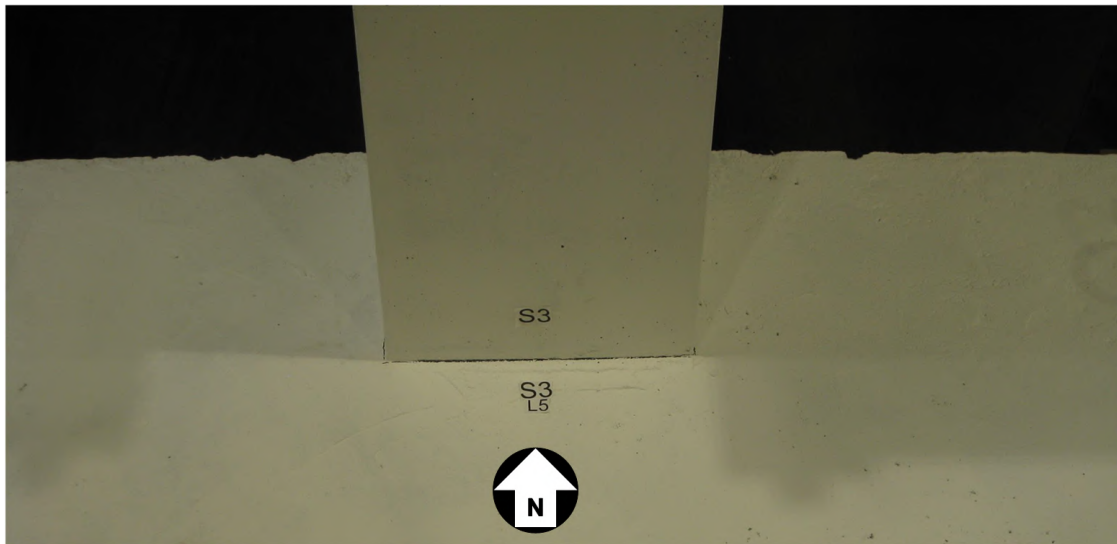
Specimen 3 slab cracks at $V = 64.9$ kN
